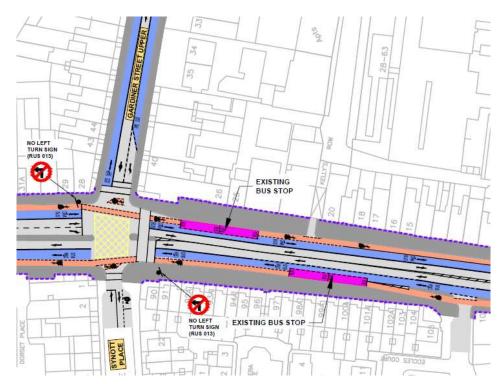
Gardiner Street Upper/Synott Place to Hardwicke Place/Eccles Street
